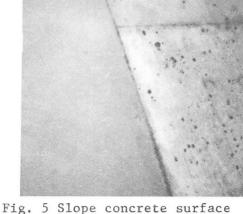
Slope concrete surface of a dome constructed by permeable form (left) and plywood form (right)
